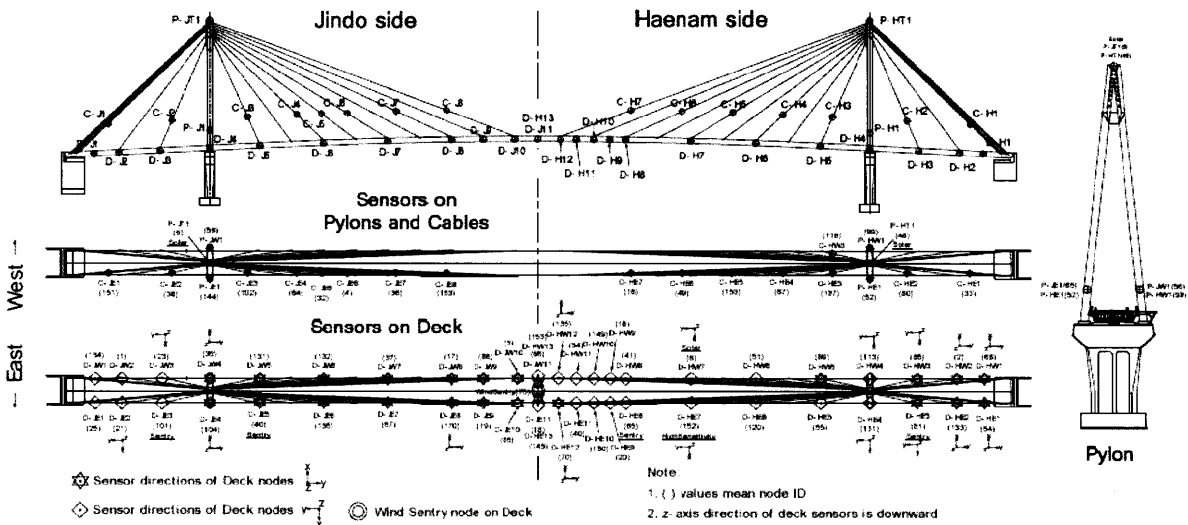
Instrumentation layout of a cable-stayed bridge (16)
